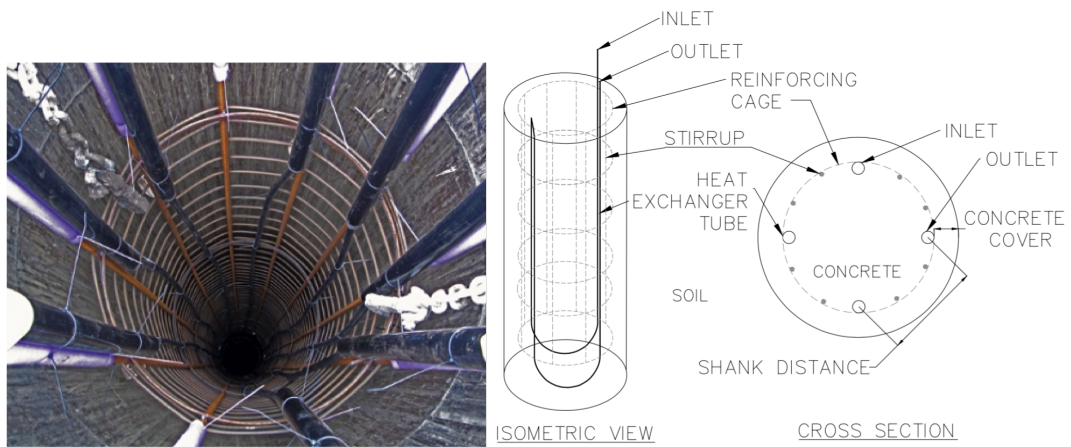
Image and sketch showing heat exchanger pipes embedded in concrete energy piles with geometry details relevant to thermal performance
